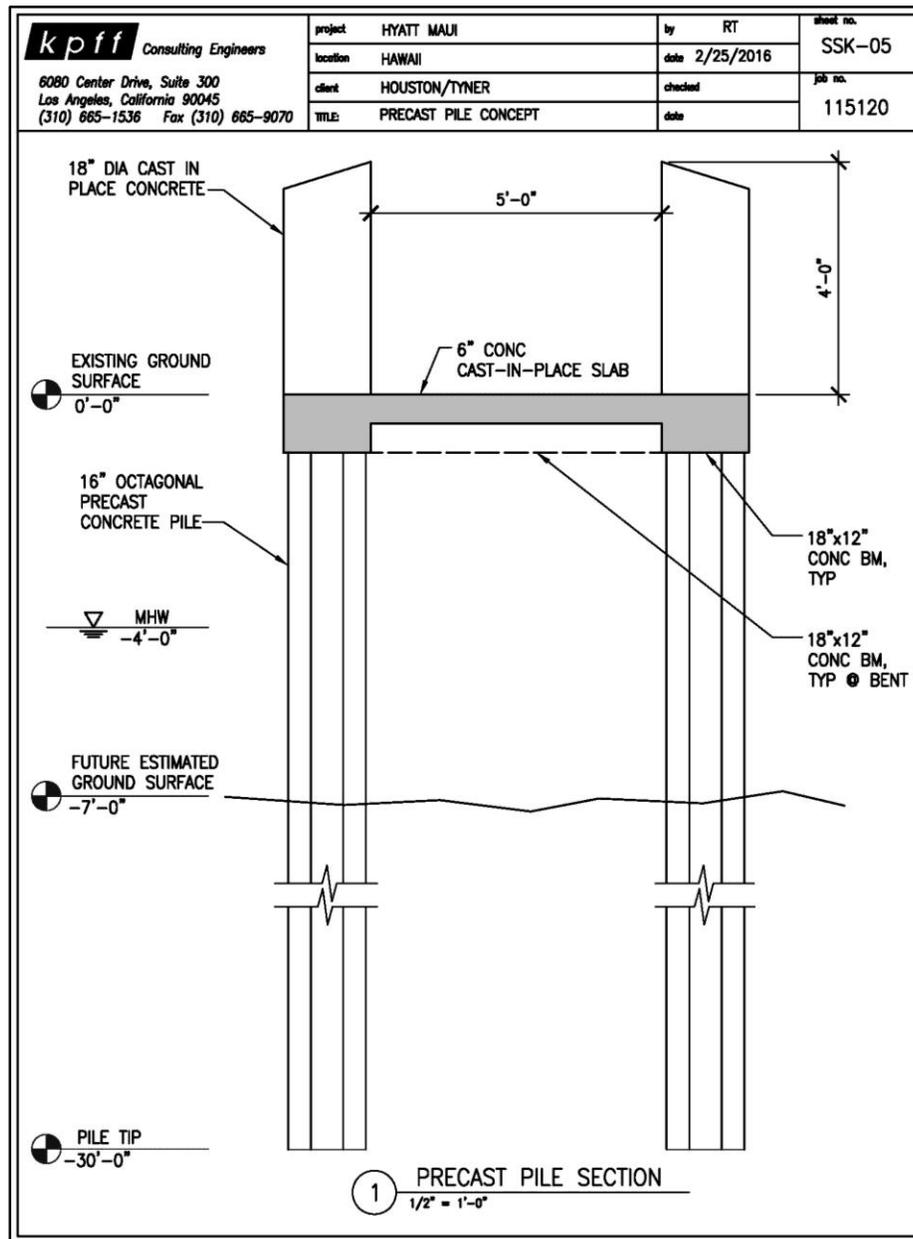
Hyatt boardwalk cross section—precast concrete pile
